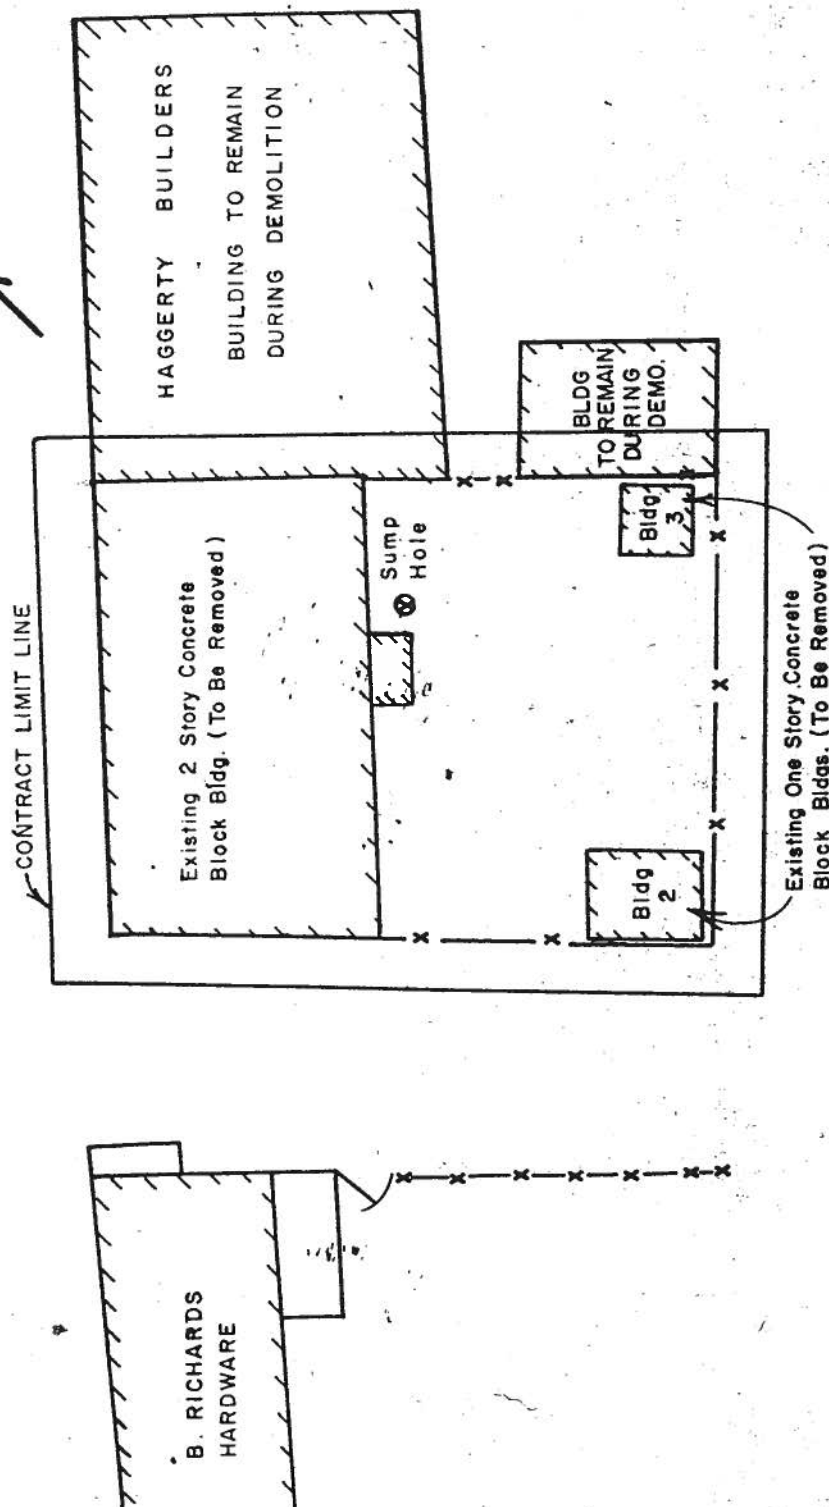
CANADIAN RADIUM AND URANIUM FACILITY SITE PLAN
